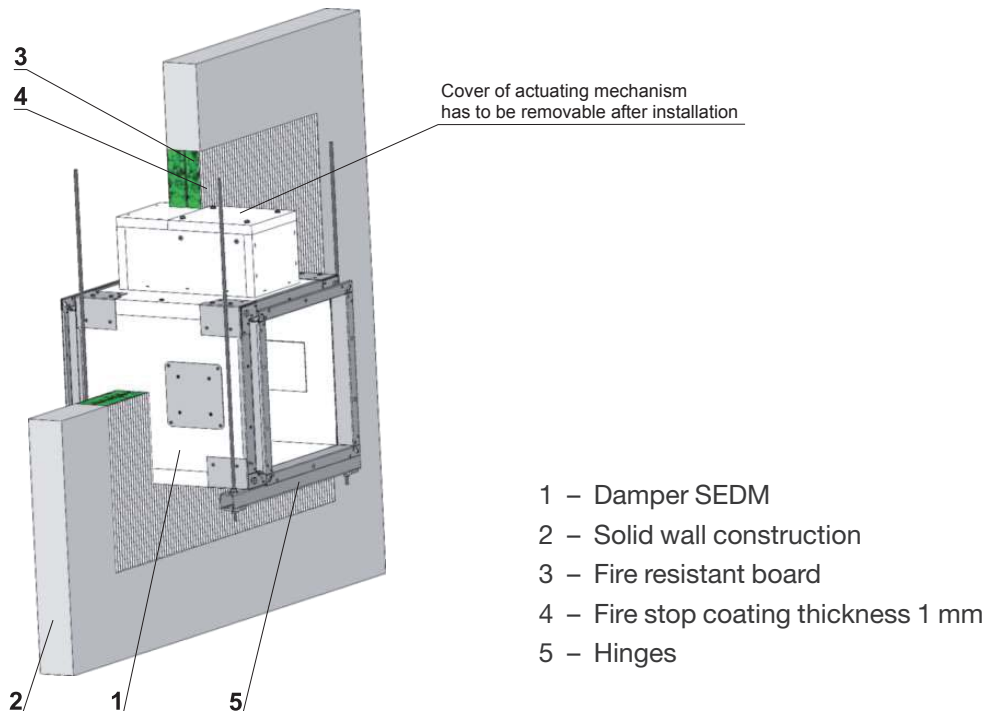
Example of installation in solid wall construction of fire compartment - horizontal blade axis position
